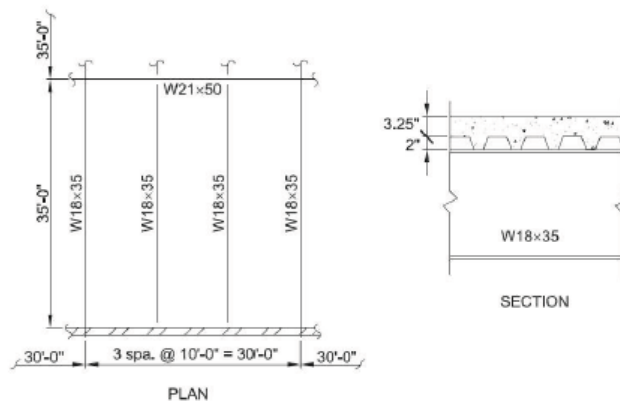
Exterior bay floor framing details for Example 4.1.
